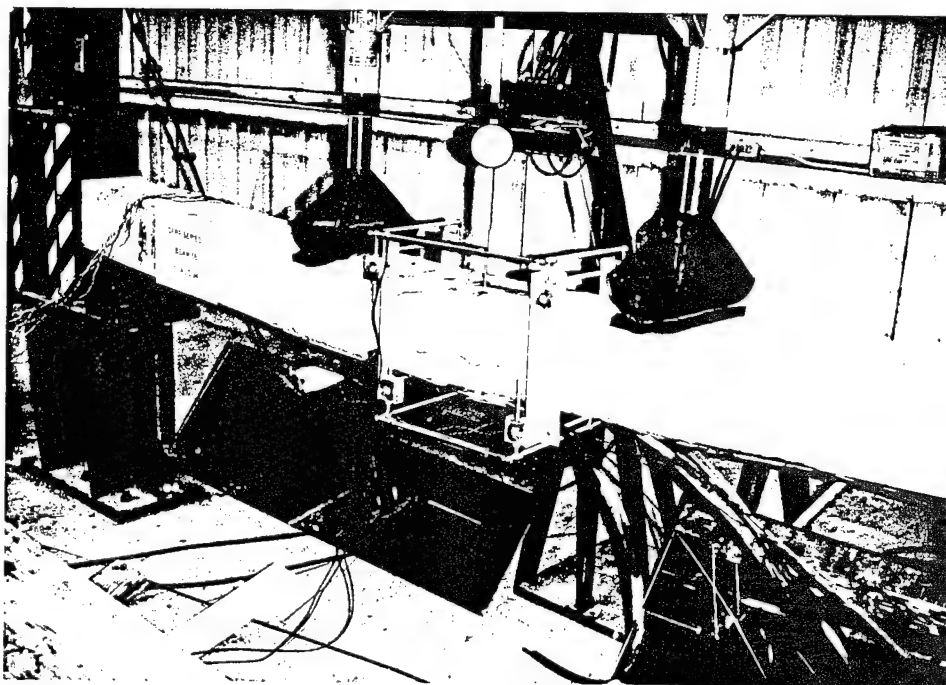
Photograph of beam failure by delamination for a Series 5 beam.
